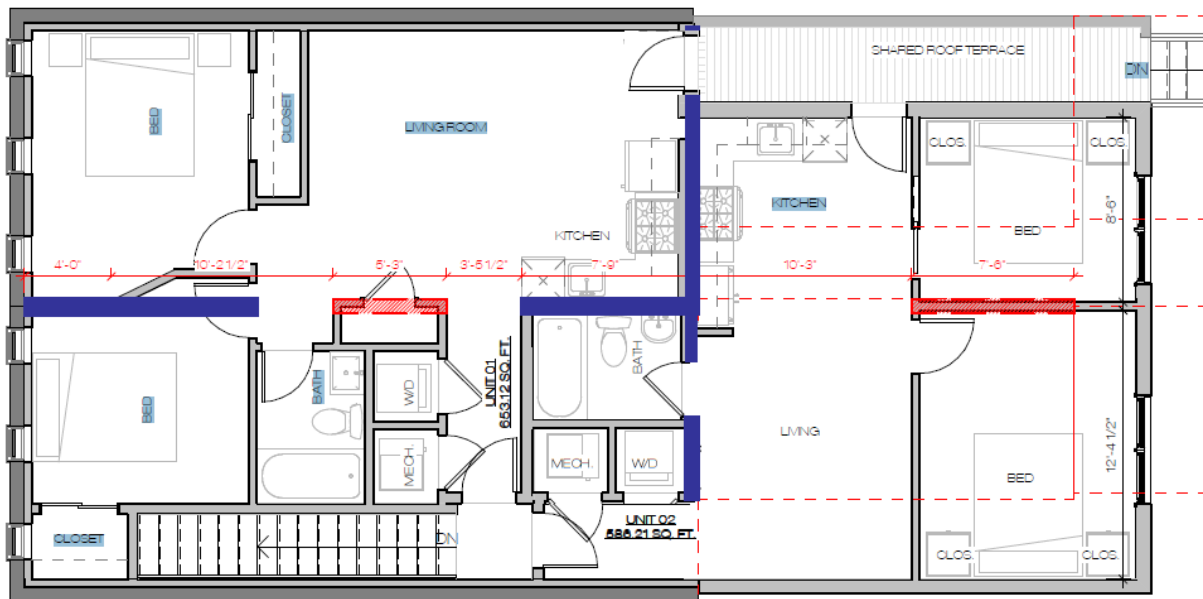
Proposed second floor. Staff recommendation to retain load bearing walls shown in blue
